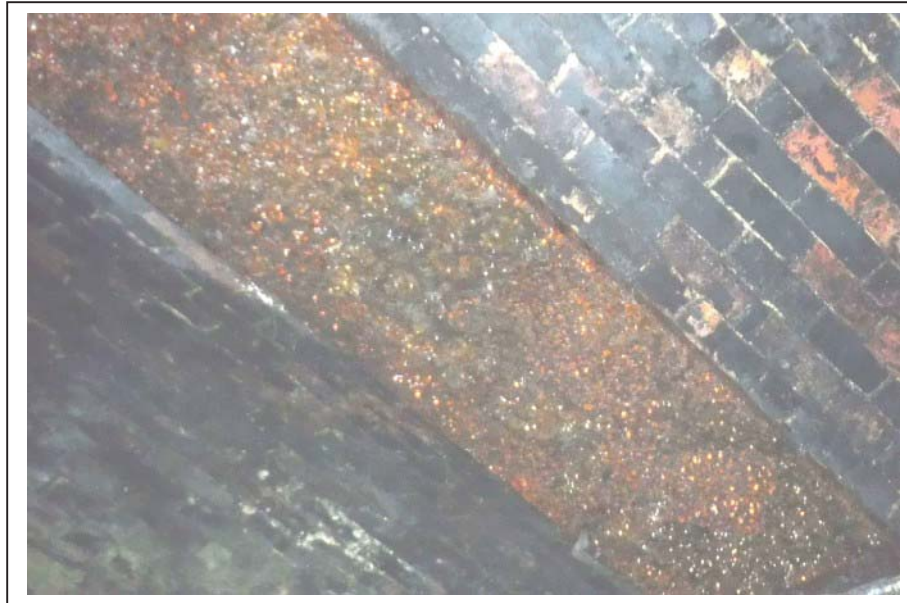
GirdersNo9-11: metal beams (510mm wide) generally in fair condition
